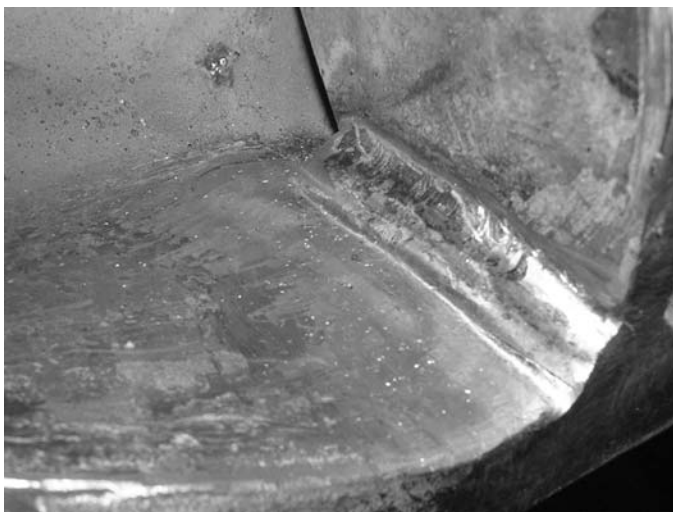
Repair weld at Stiffener 2 on Specimen 1D/R-1.
